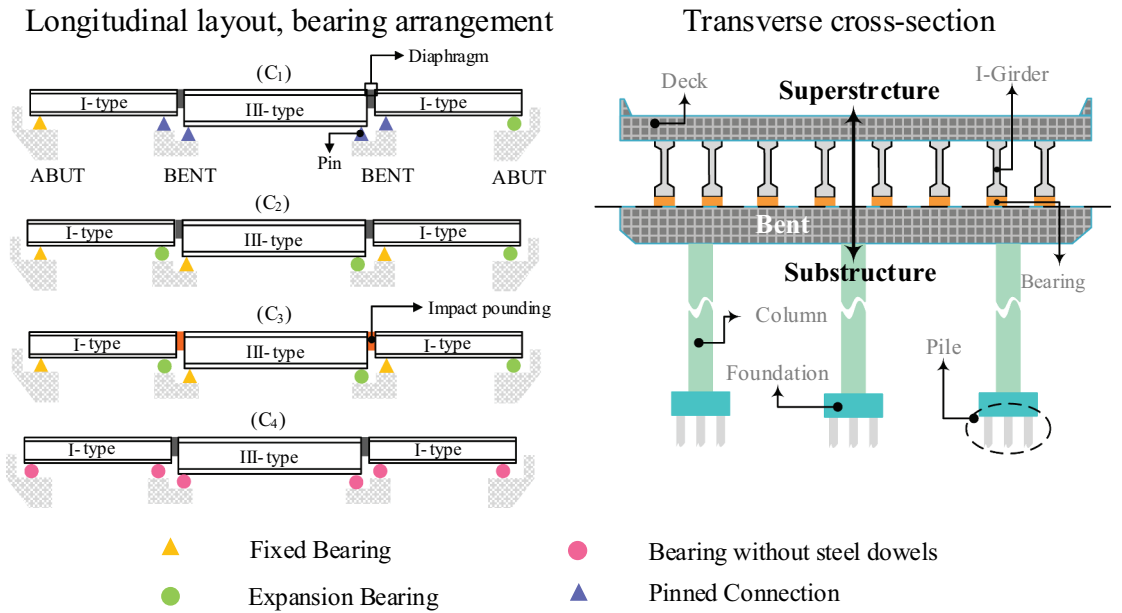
Schematic view of a typical multi-span RC I-girder bridge with bearing distribution across structural systems.
